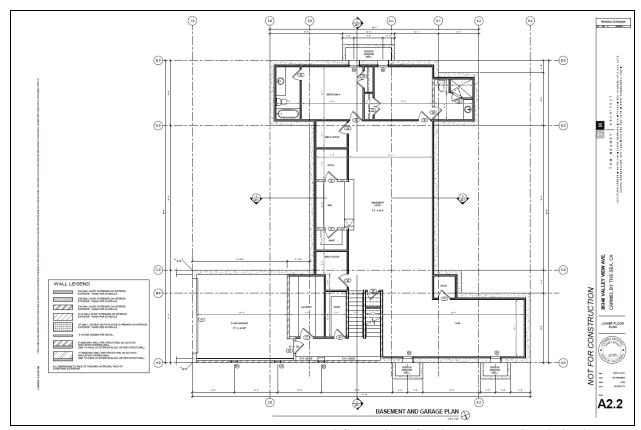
Basement and Garage Floor Plan: Proposed floor plans for the new two-level single family dwelling at 26346 Valley View Avenue.
